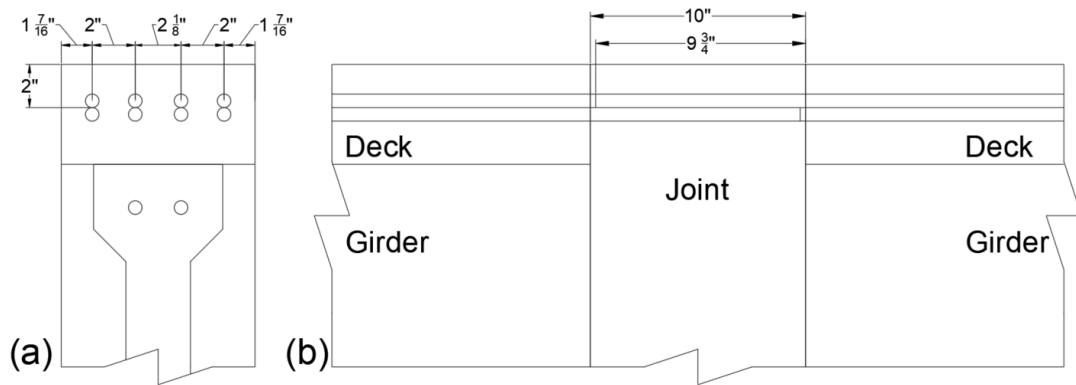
Negative moment lap splice cross-section (a) and elevation (b) view
